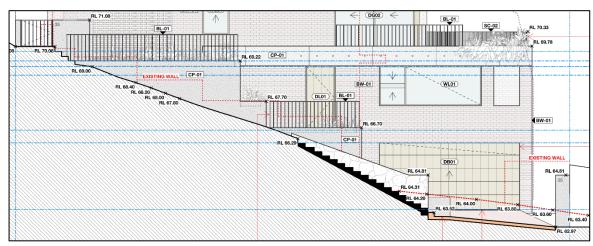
Section plans showing levels of excavation to accommodate the dwelling footprint (Source: Baikie Corr Architecture).
